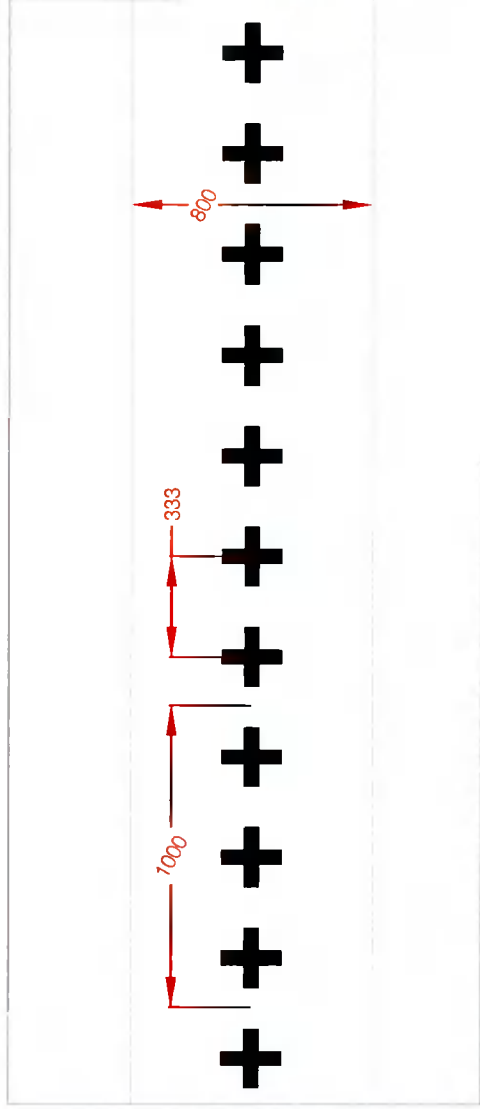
TYPICAL DOUBLE STAKING DETAIL
